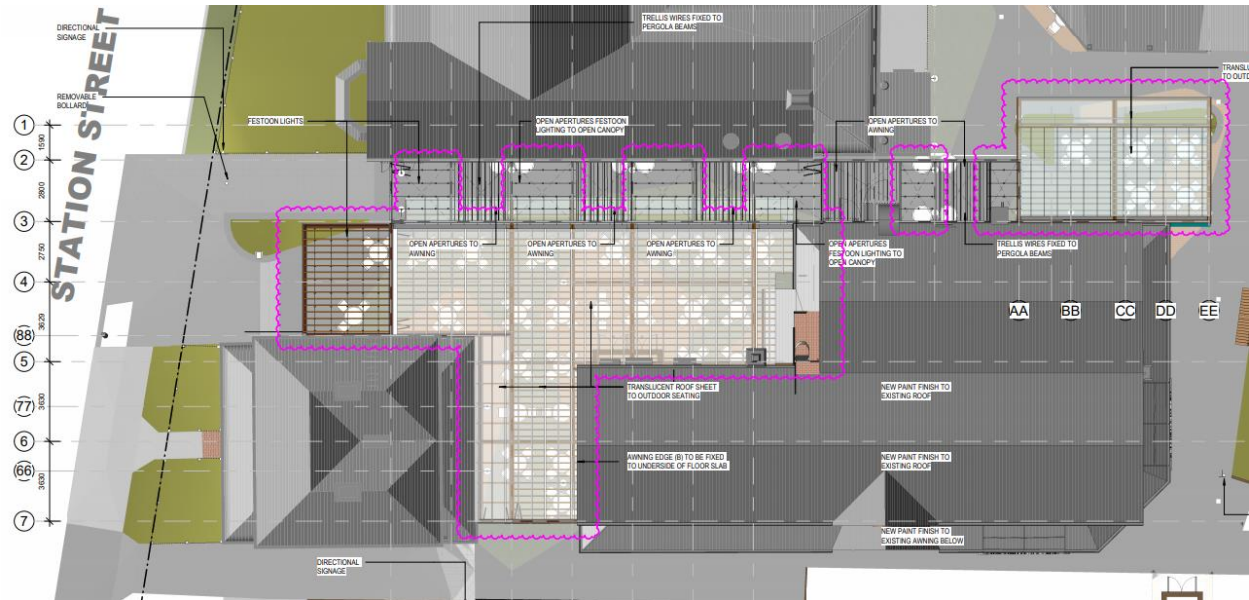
Plan of approved external works DA19/0273 (Source: BN Group)
